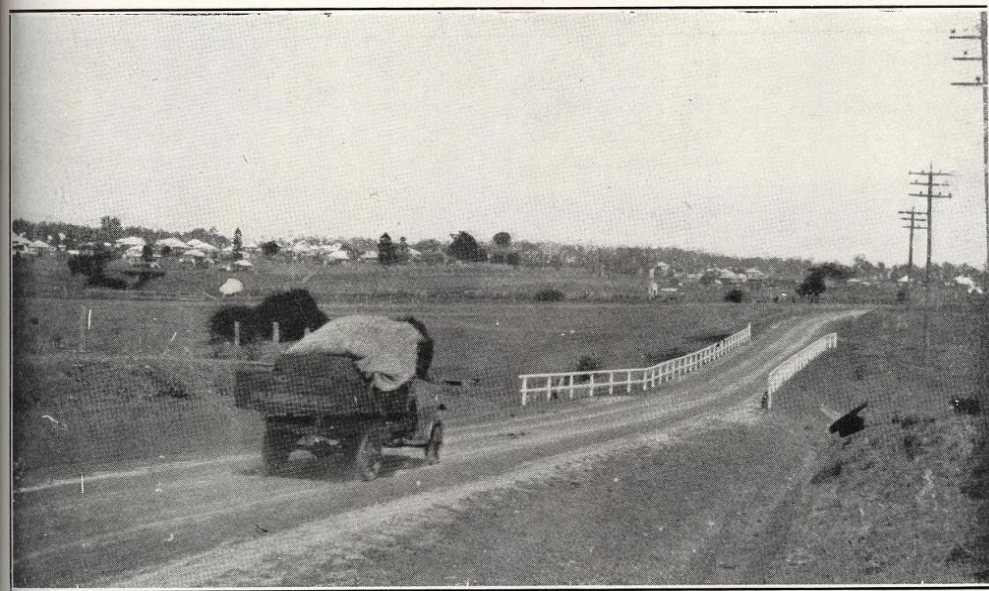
BRISBANE-IPSWICH ROAD (NEAR GOODNA).
